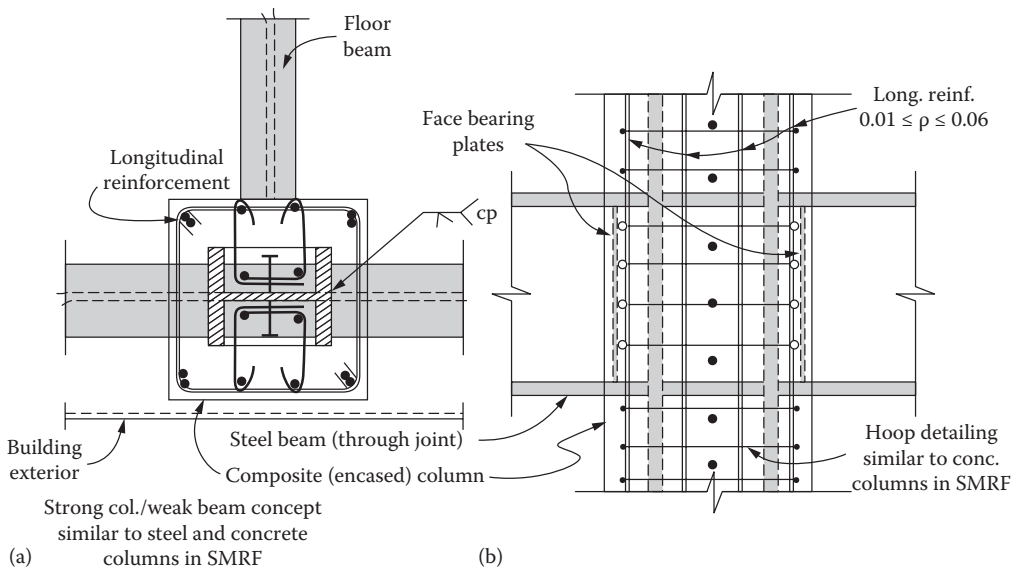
Spandrel beam-to-composite column connection: (a) plan; (b) elevation.
